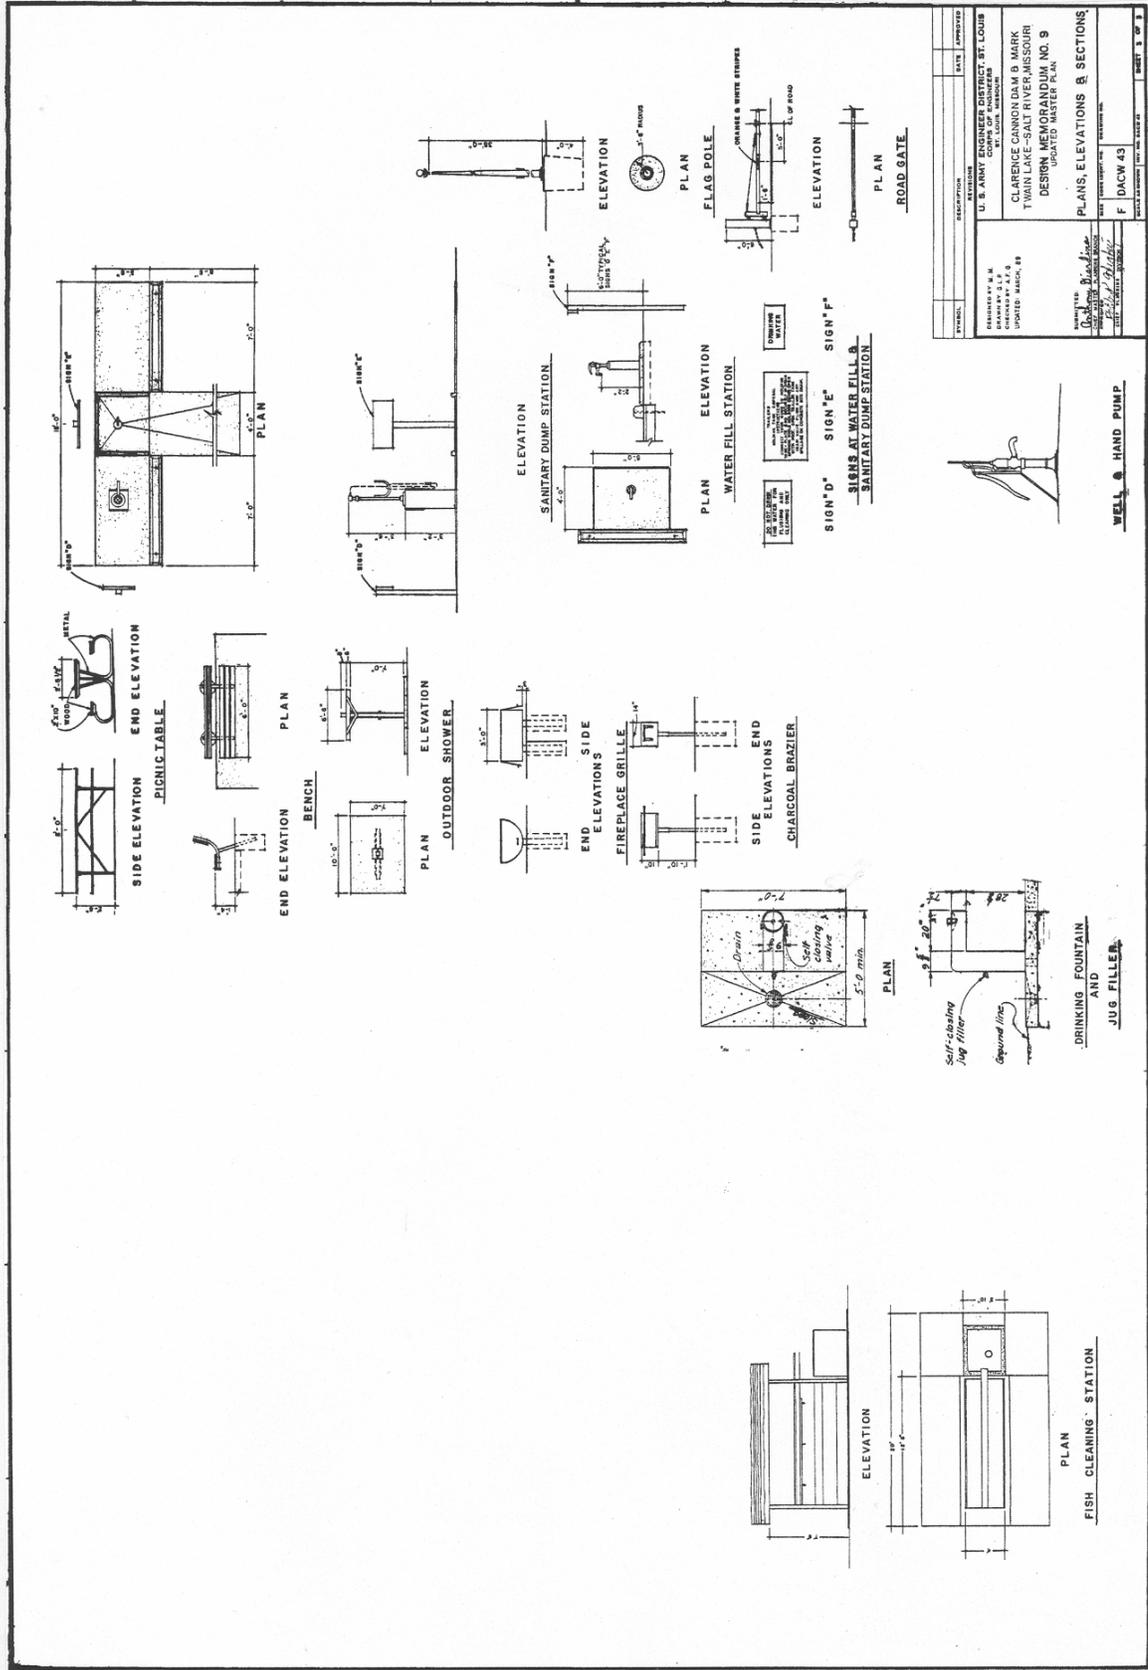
Miscellaneous Plans, Elevations, and Sections cont'd
